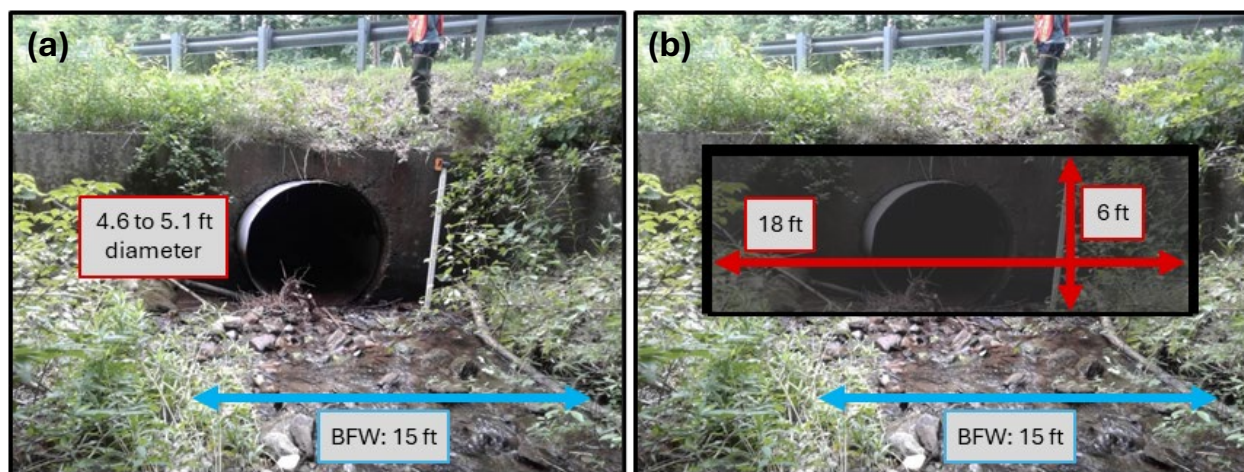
(a) Photograph of existing 4.6 to 5.1-ft diameter pipe culvert, (b) photograph of existing pipe culvert with superimposed MA SCS box culvert design (McCallister et al., 2026; North Atlantic Aquatic Connectivity Collaborative, 2019). BFW refers to the estimated bankfull width.
